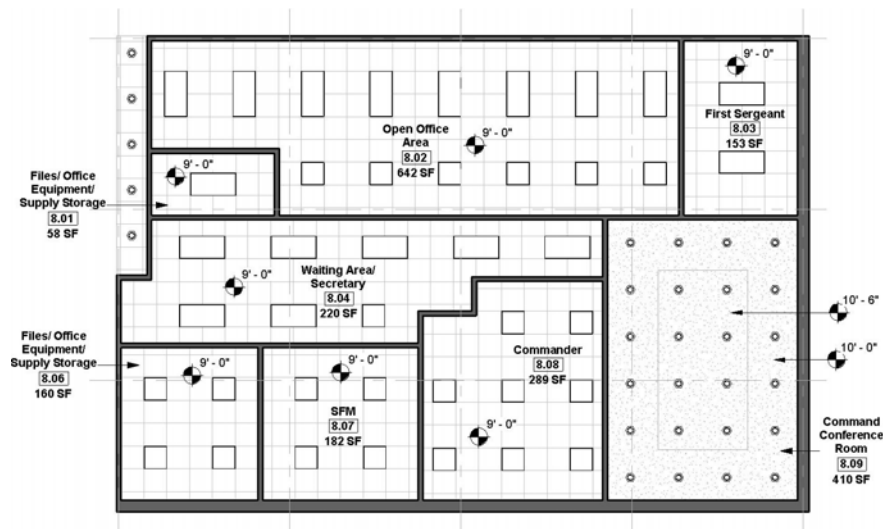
Module 8: Command/Orderly – Reflected Ceiling Plan
